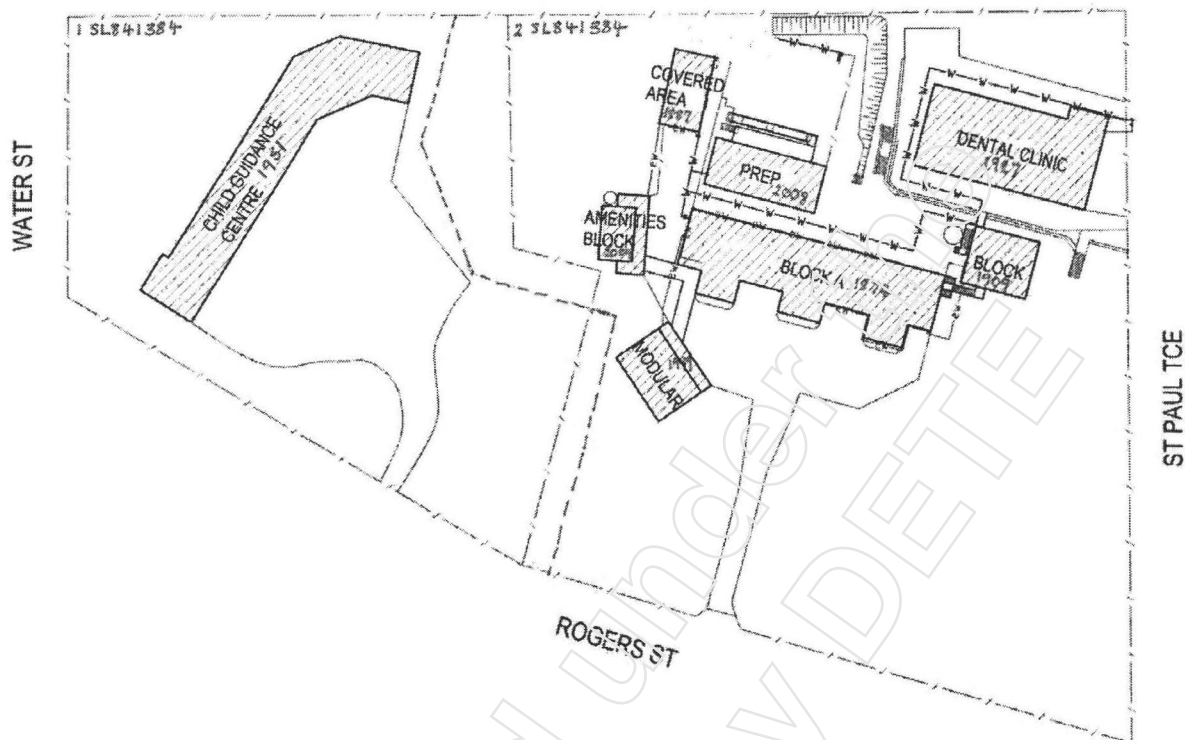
Plan showing existing buildings, based on a block plan dated 2010 (eplan). Not all buildings are significant even though they stand within the heritage registered place. The dotted red line shows the approximate location of the boundary between the lots.
